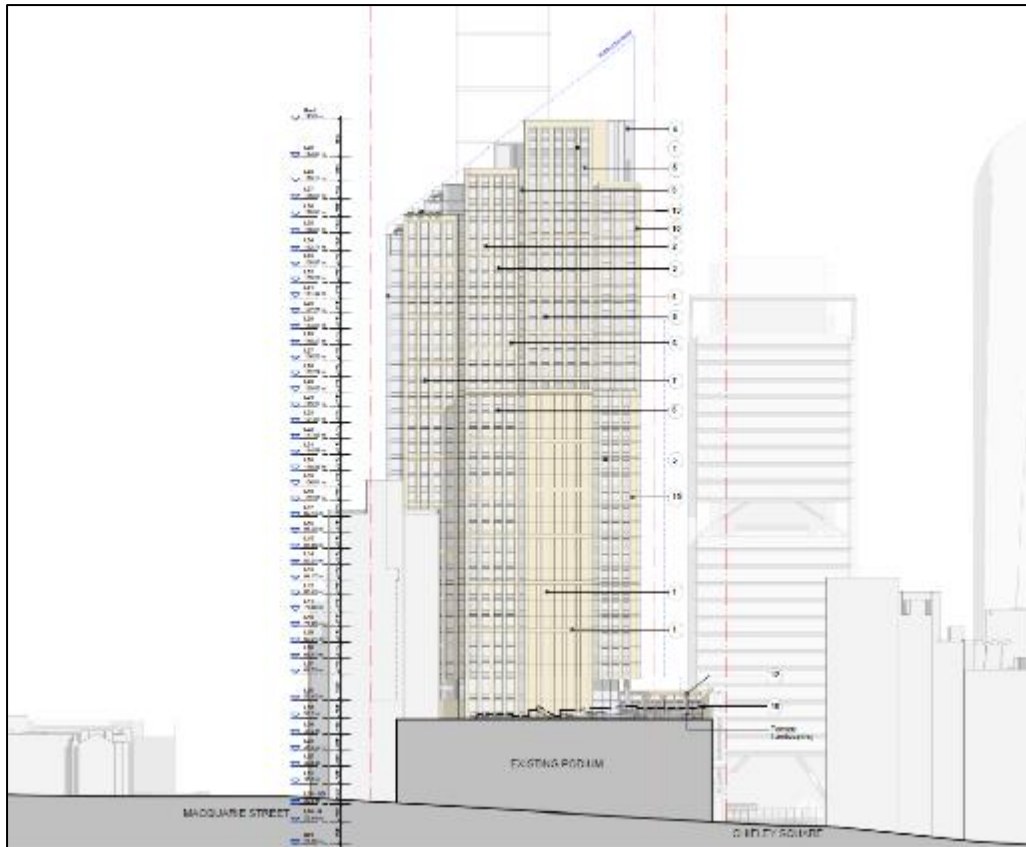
Proposed north elevation (existing Chifley Tower in front)
